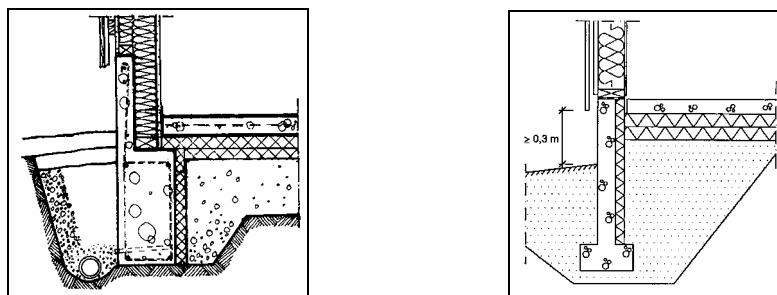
Left. A dangerous solution from the 1970s. The floor and the ground are on the same level. The bottom of the timber frame extends underground. Right. A safe joint of the floor and the exterior wall.
